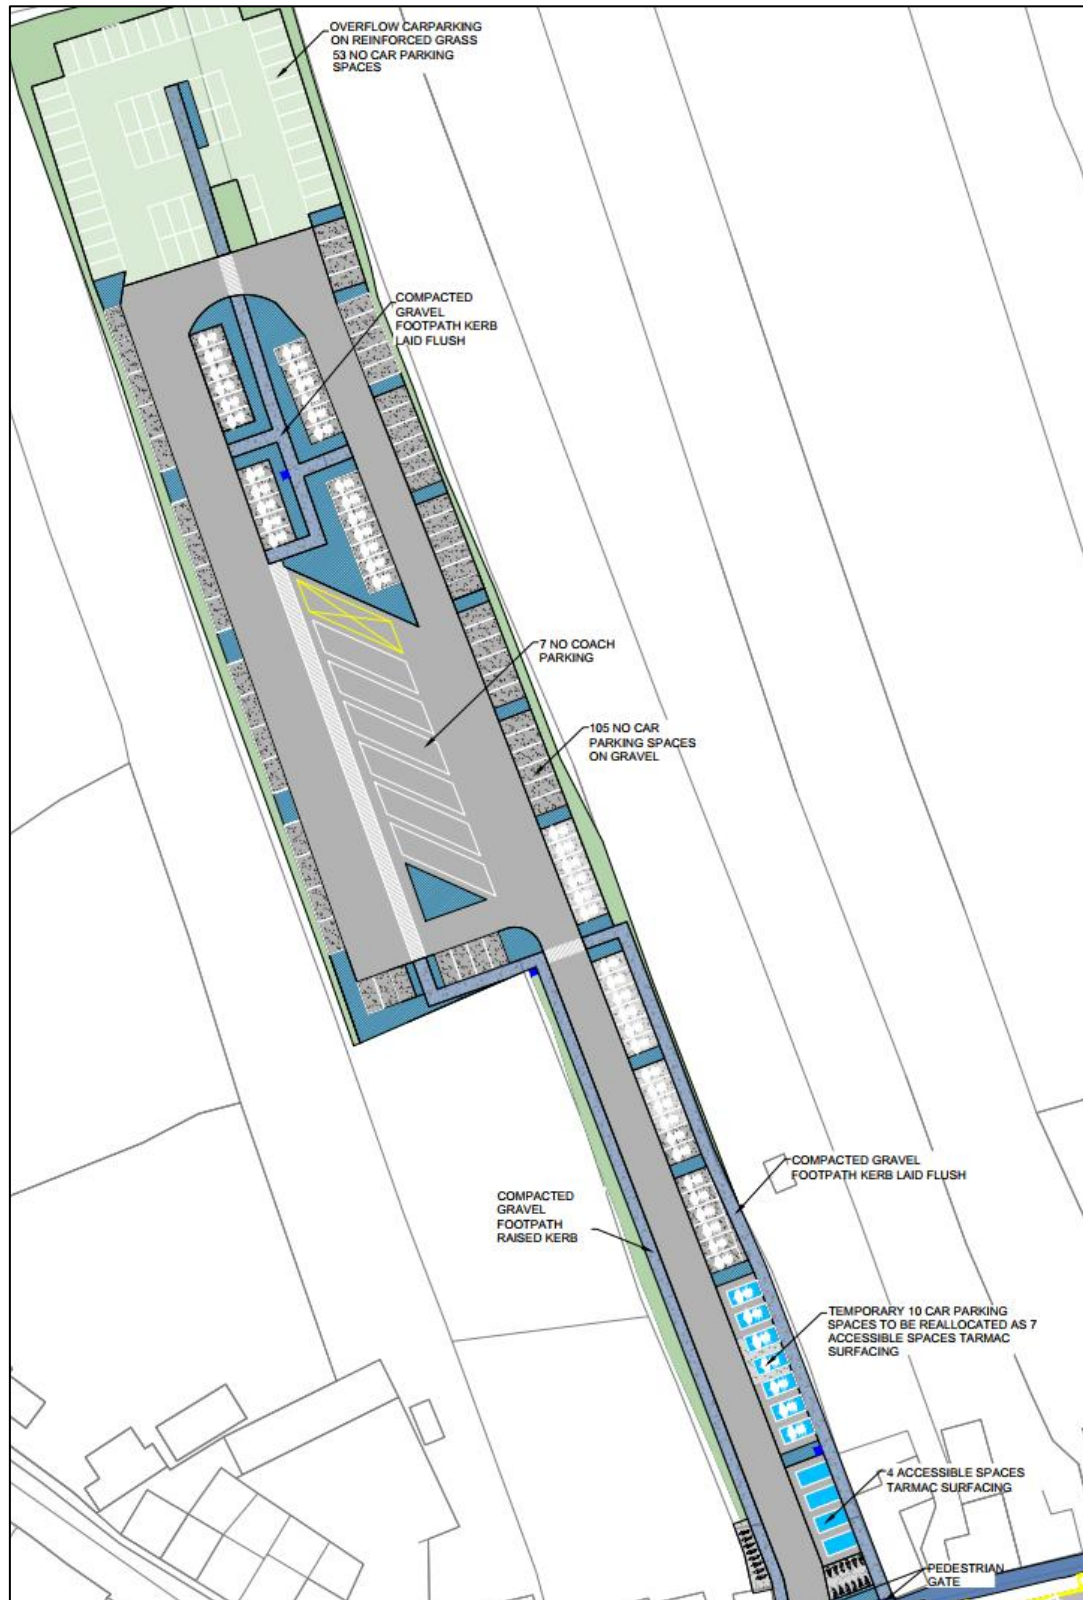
Extract of proposed site layout drawing of new Mountshannon Village car park at Main Street.
